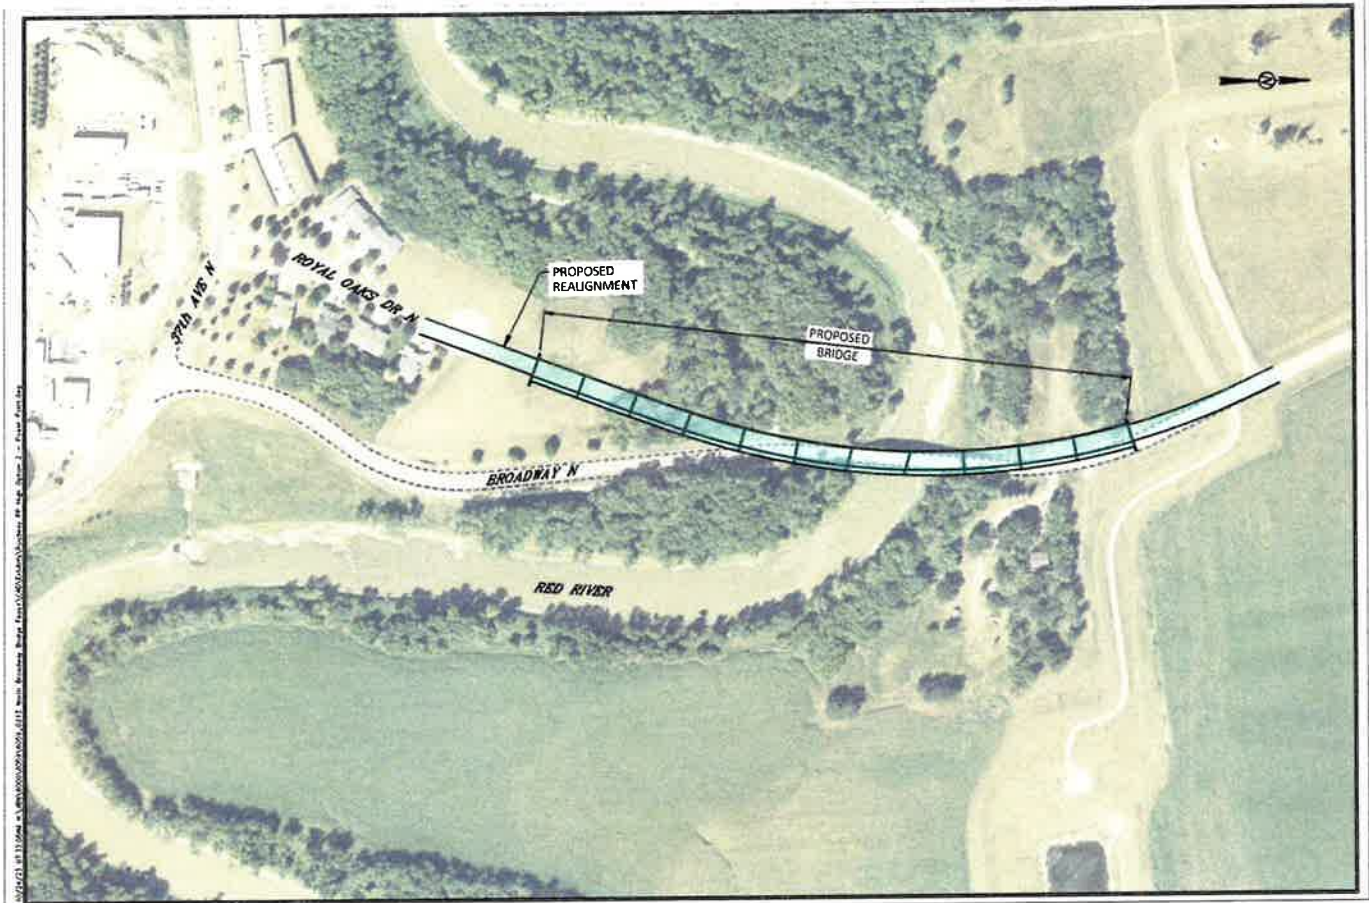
Option 2b Proposed Roadway Realignment and Bridge
